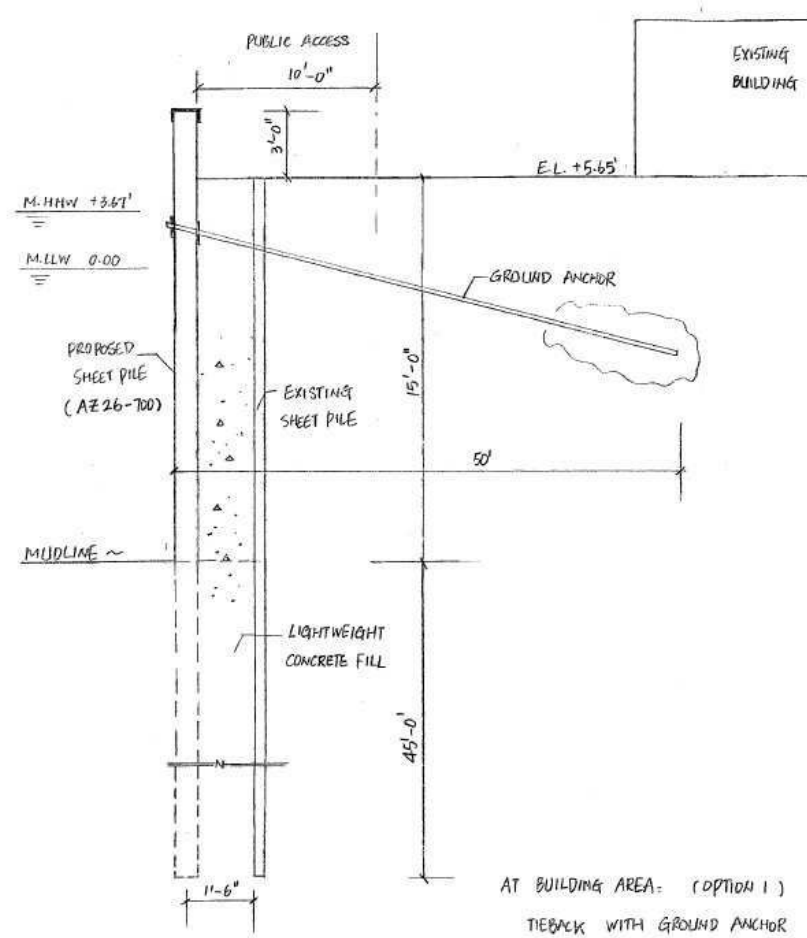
Typical Cross Section for Segments A & B using Alternative 1 (Tie back with Ground Anchor System)
